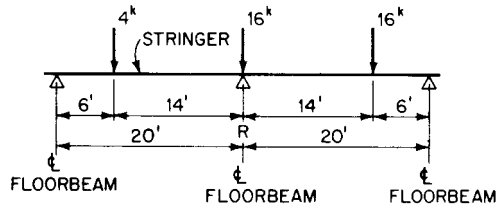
Positions of loads on a stringer for maximum live load on a floorbeam.
